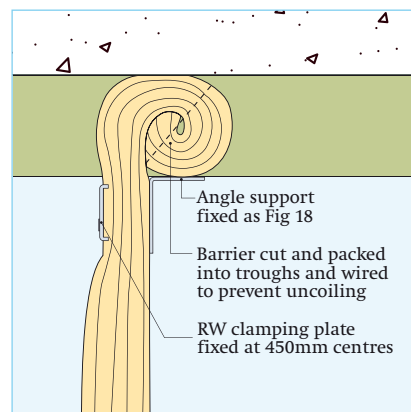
50mm Fire Barrier running across ribbed soffit – Section
